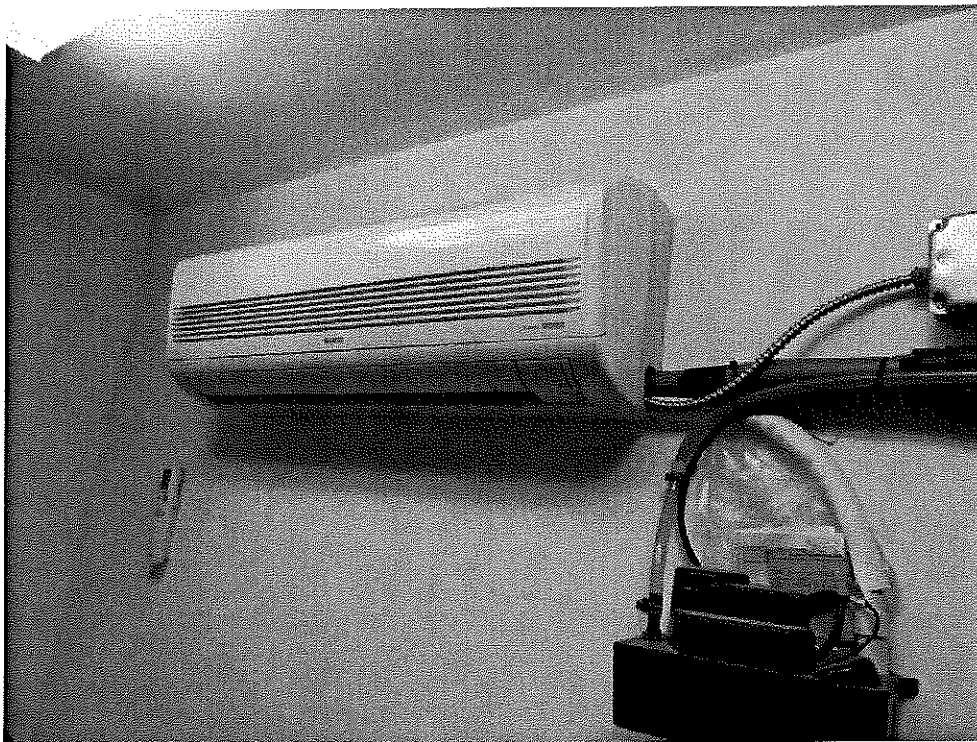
Wall-Mounted Split Air Conditioning Unit Evaporator (Typical)
